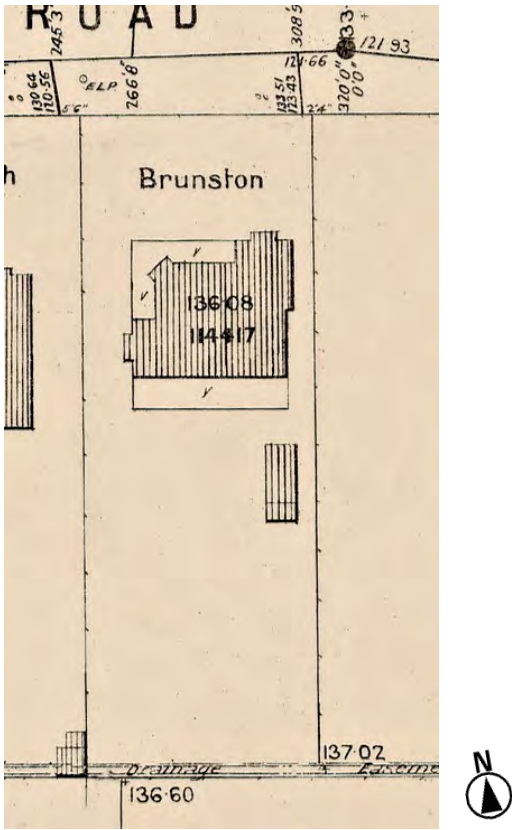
MMBW Detail Plan No 2564 showing the footprint of the house at 29 Omama Road, 1925 (Source: SLV)
